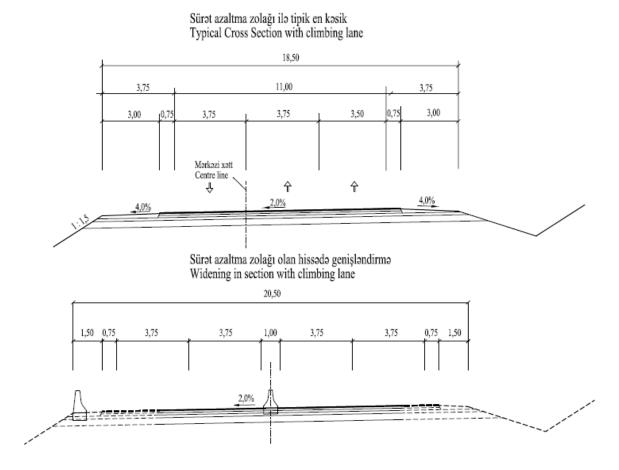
Option (iii) Typical Cross Section for Widening in Sections with Climbing Lane
